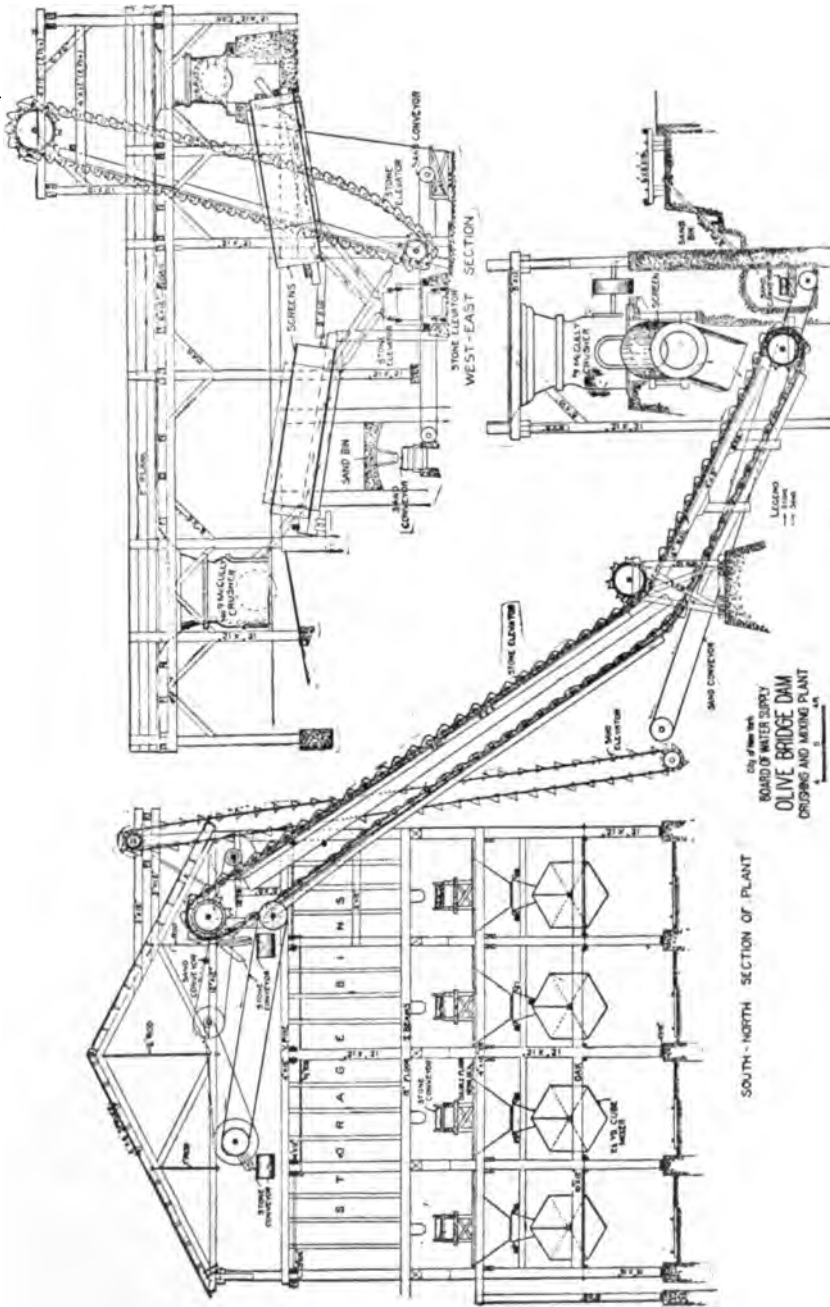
Cross-section of Crushing and Mixing Plant Used at Olive Bridge Dam, Showing Layout of Machinery.
